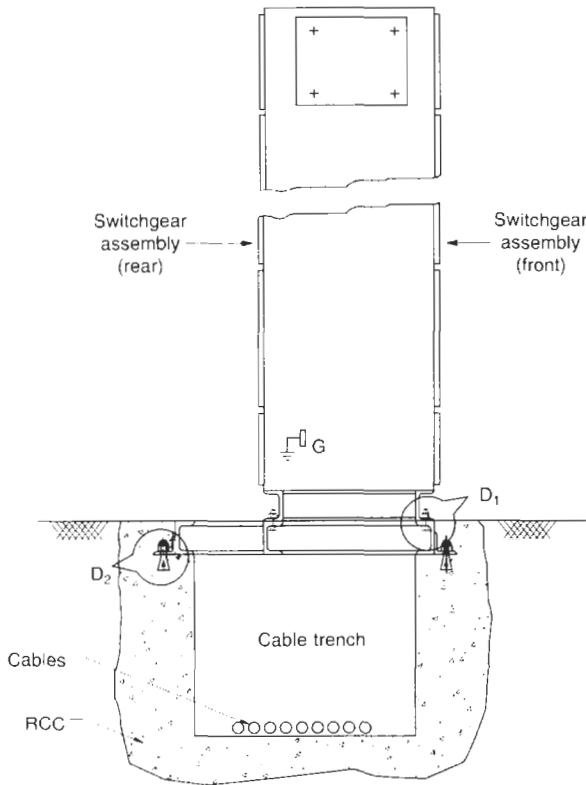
(b) A typical installation of a low-rating switchgear assembly on a cable trench
